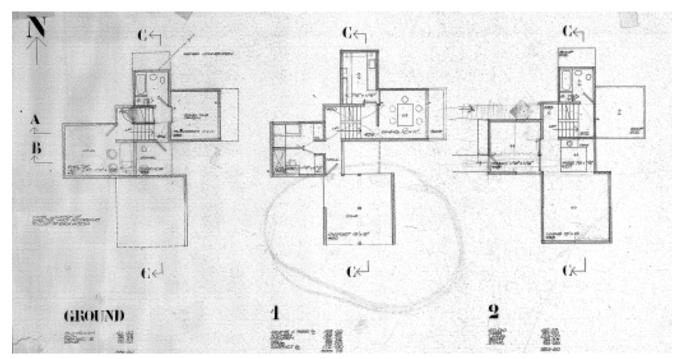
Wasserman House Floor Plans, John Fowler, 1963.
